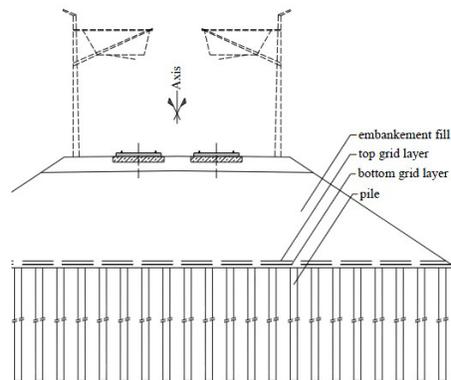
Geosynthetic-reinforced and pile-supported embankment
